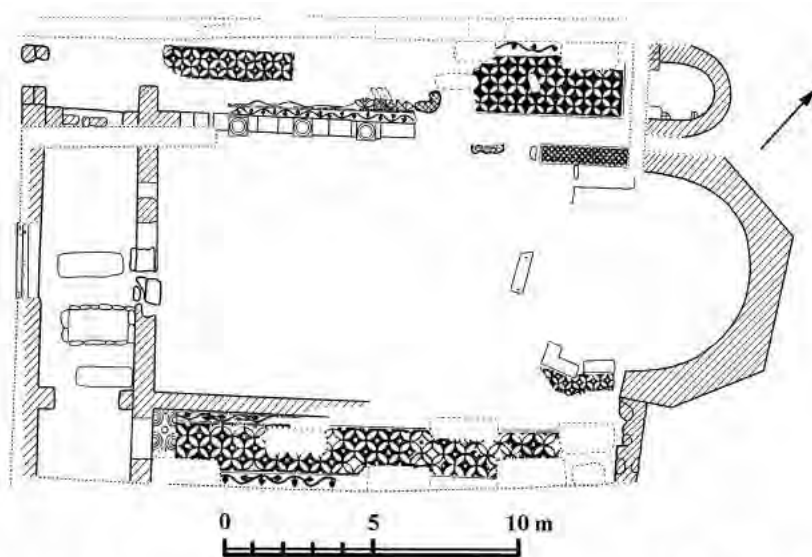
Basilica 1932. Excavation Plan (after G. Belov [59, pl. II]). The apse of the north aisle is a later addition.
